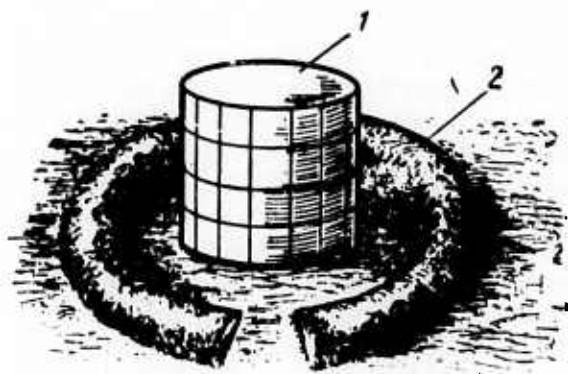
Structure with earth embankment around liquid fuel tank: (1) liquid fuel tank; (2) earth embankment.
